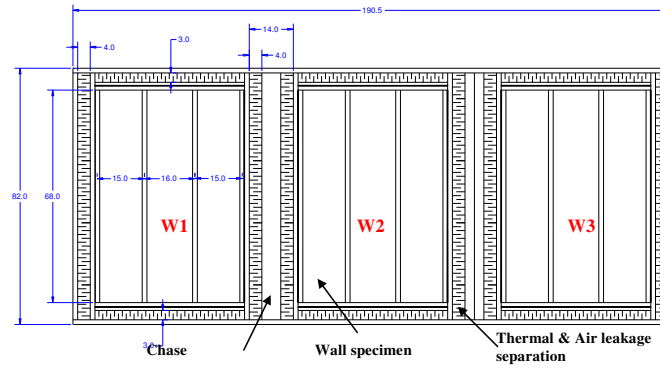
Elevation view from indoors of the 3 test specimens and the separating chases
